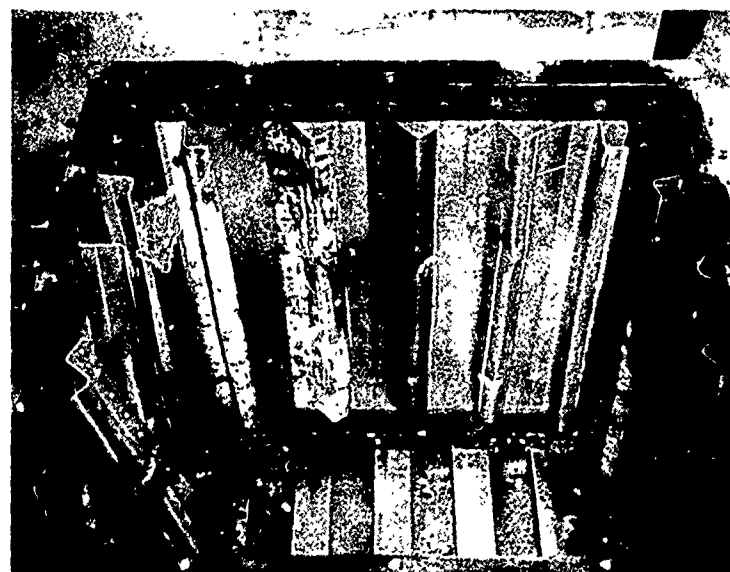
Structural damage resulting from MIL-CUBE test 6.
